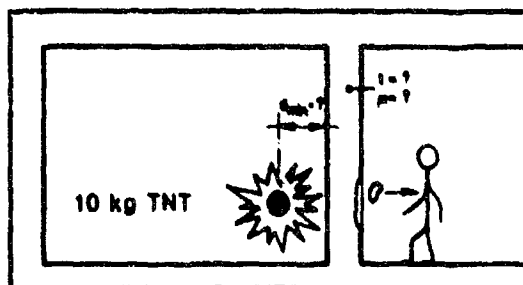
Example: Design of a Dividing Wall in an Ammunition Factory
